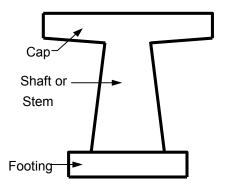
Single Stem Pier (Cantilever or Hammerhead)
